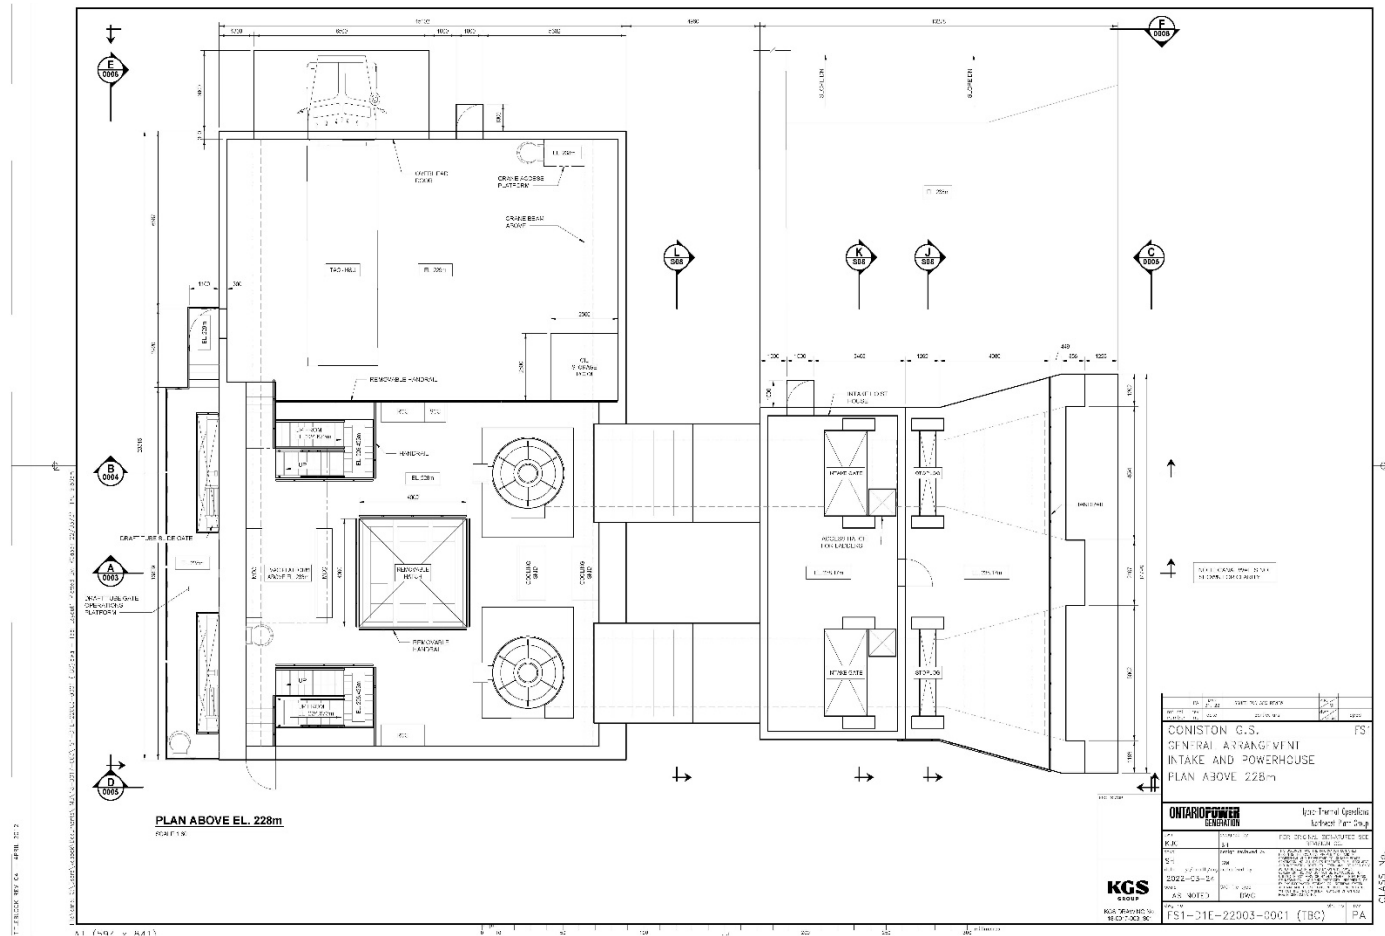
Proposed Powerhouse Arrangement for Intake and Power at Plan Level Above 228 MASL
